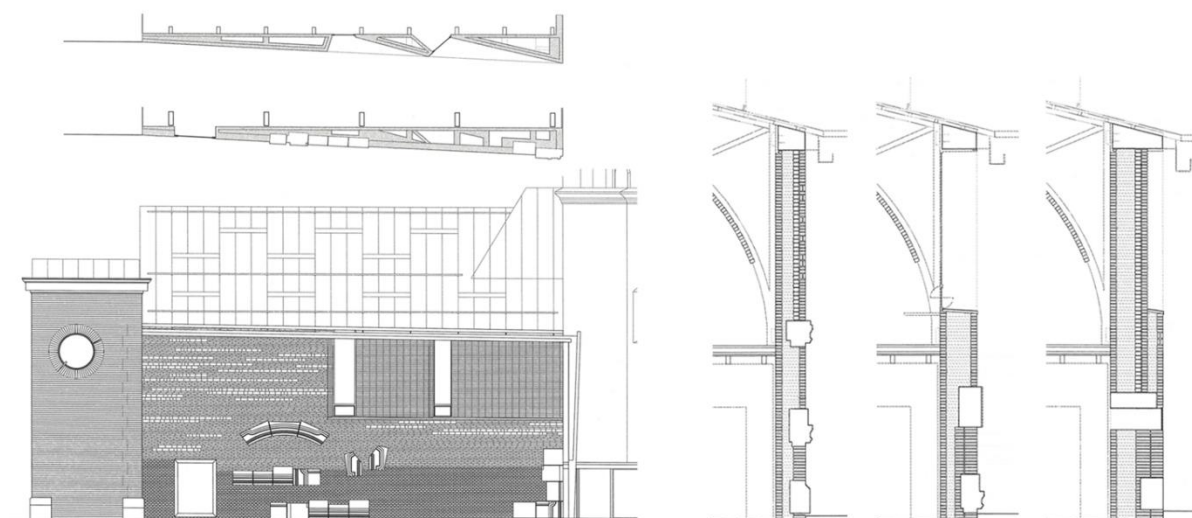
Construction details of the Escuelas Pías “recomposed wall”, drawings by Linazasoro&Sánchez
